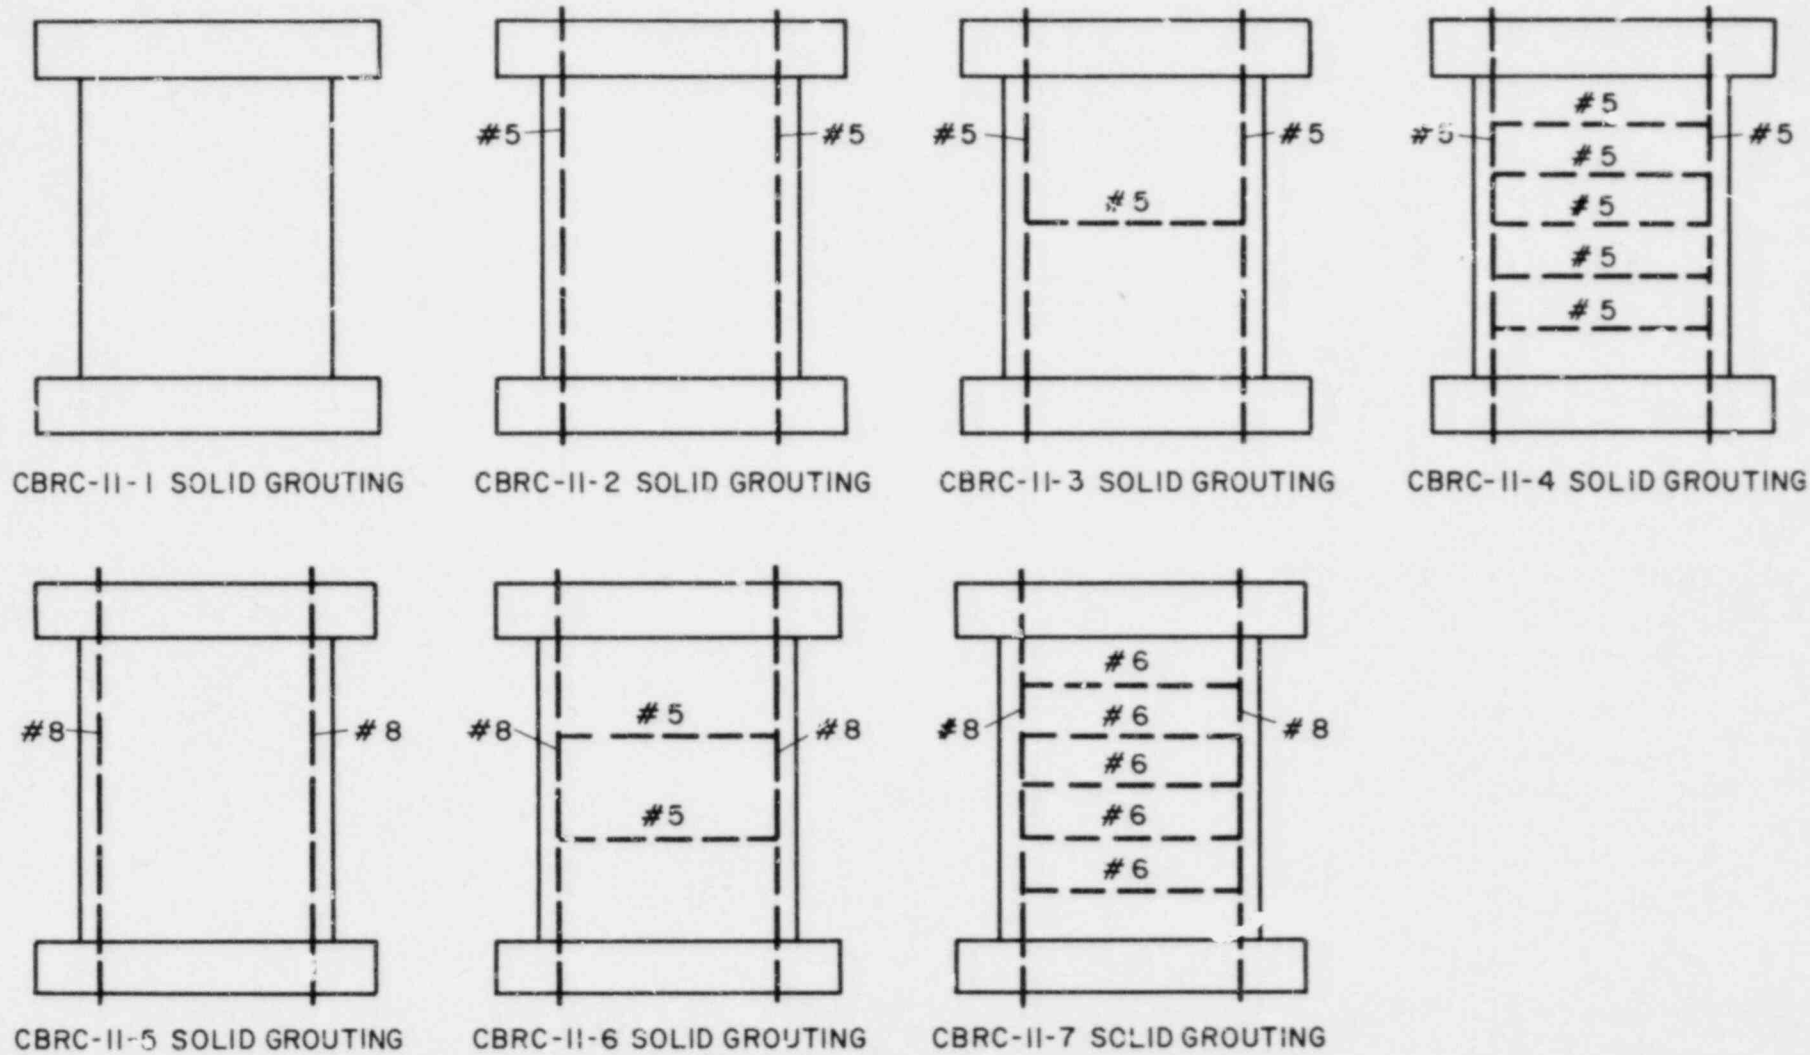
(c) REINFORCING STEEL ARRANGEMENTS FOR GROUTED CORE BRICK PIERS (CBRC)
